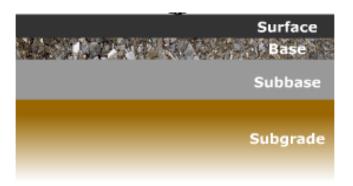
Flexible pavement typical layers Courtesy: Arika et al. 2009
